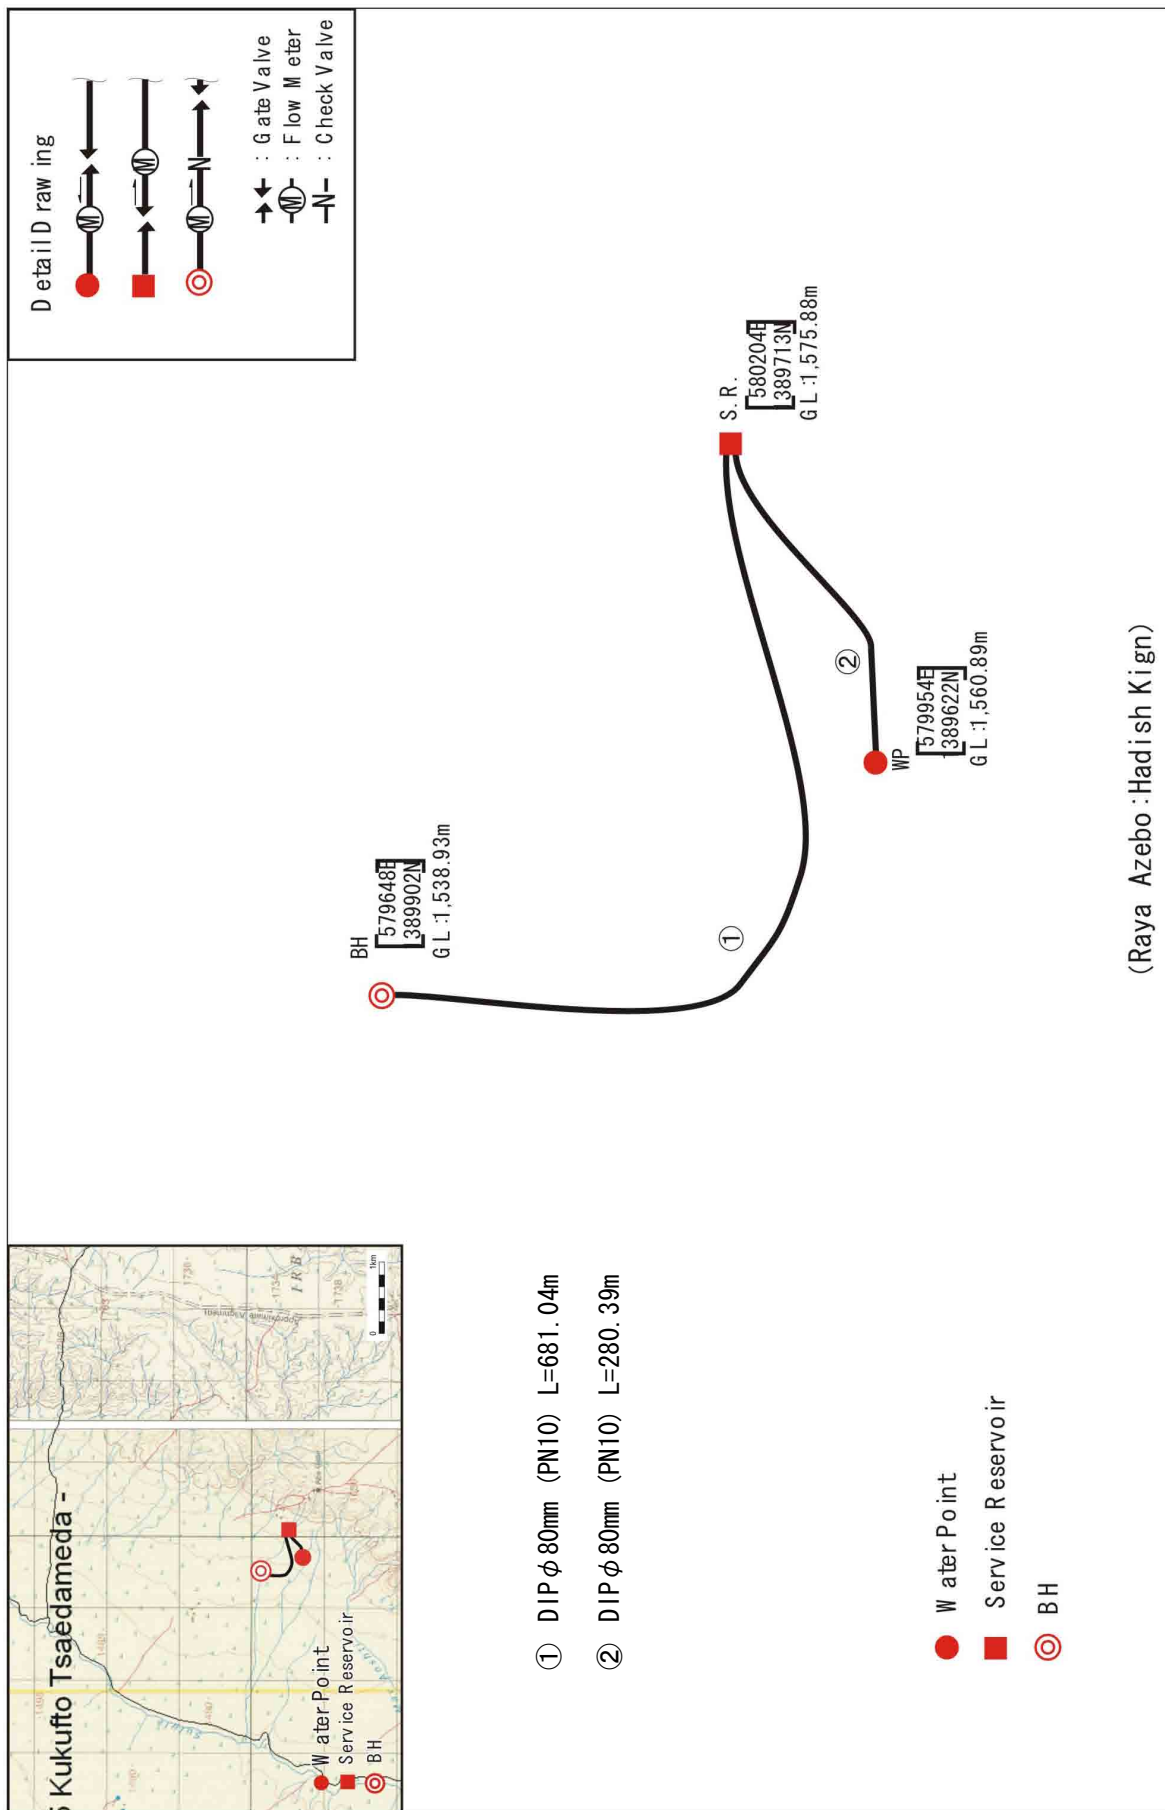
Layout for Water Supply Facility at Hadish Kign
